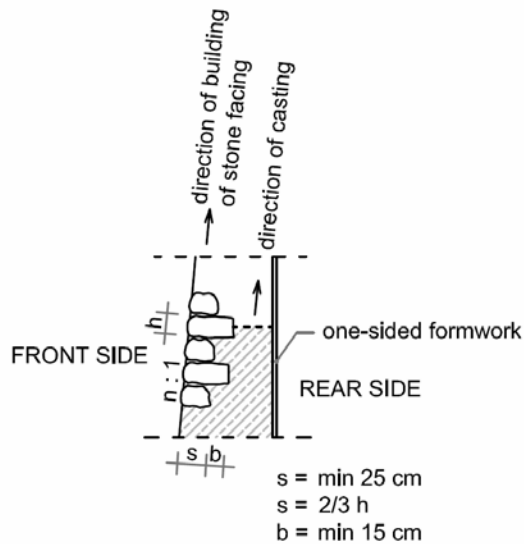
Detail of retaining/supporting wall where the stone facing is built simultaneously with the casting of the rear side
